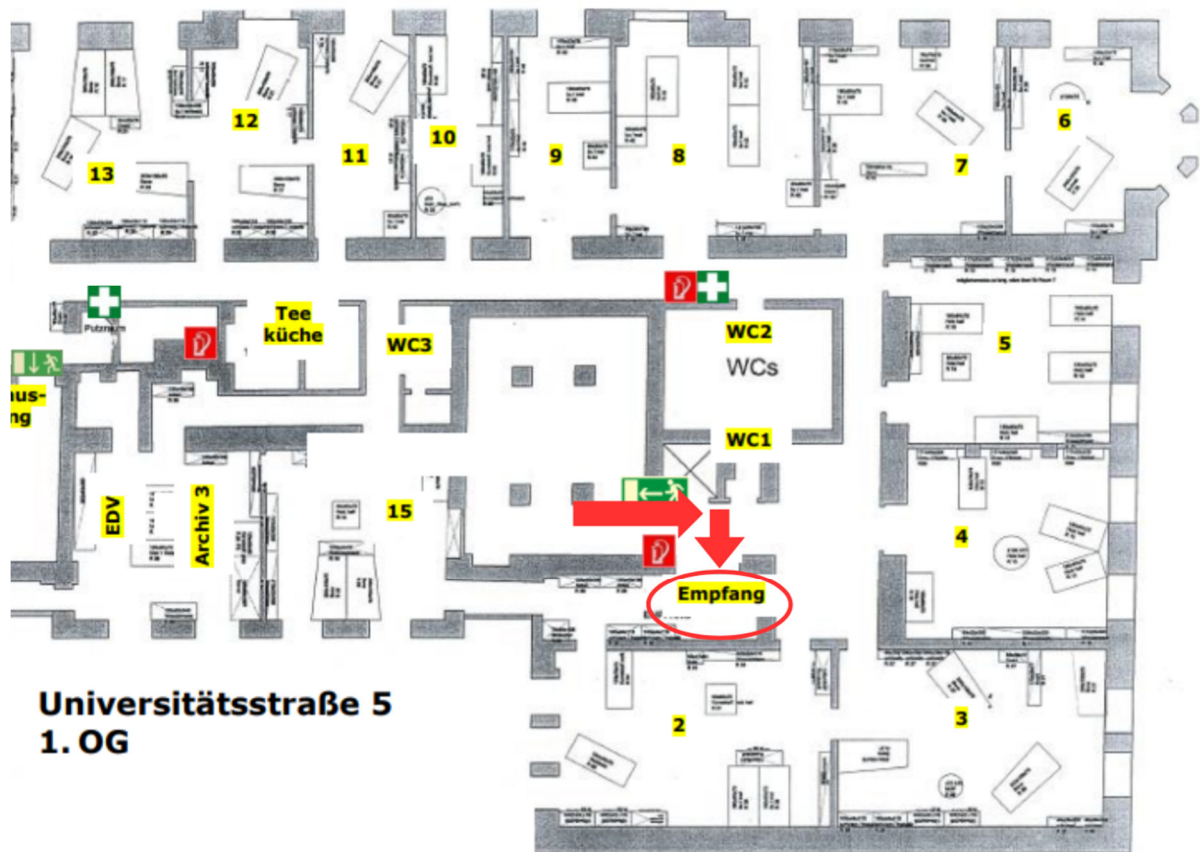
Floor plan of Universitätsstraße 5, 1<sup>st</sup> floor: Reception
